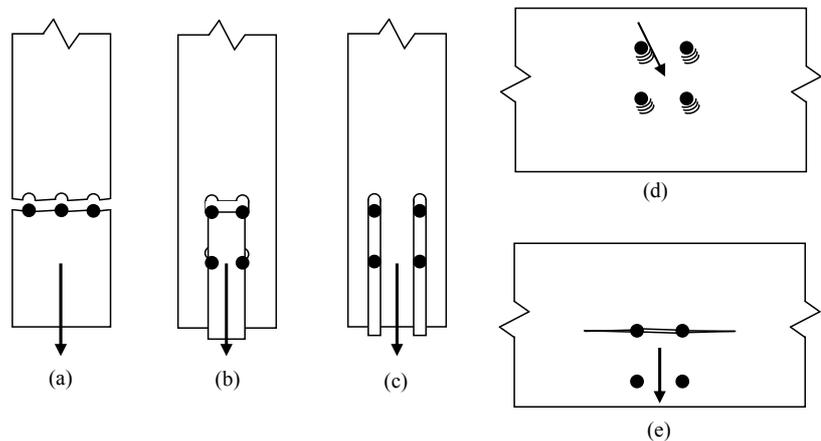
Observed failure modes for timber bolted connections (a) net tension (b) group tear-out (c) row shear (d) bearing (e) splitting
